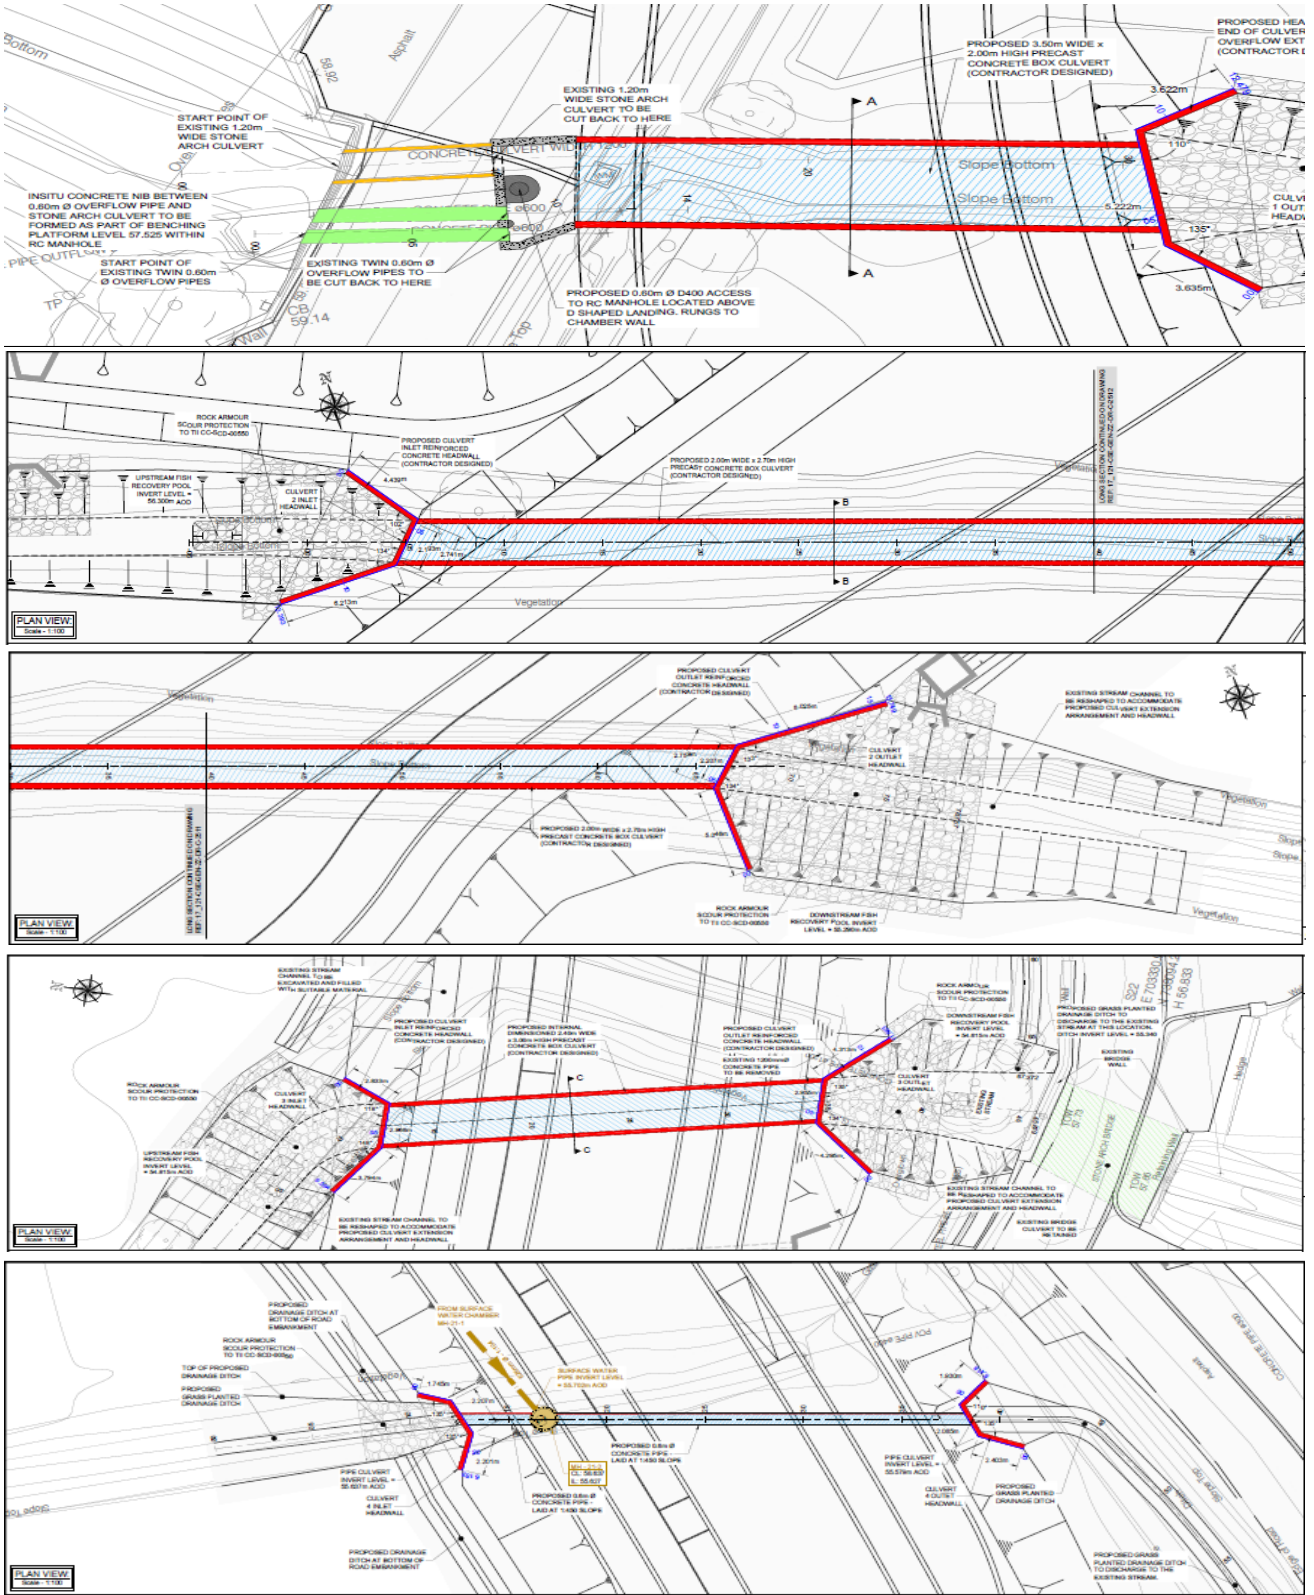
Construction Drawings - Clifton Scannell Emerson Associates, 2020). 1) Culvert 2 – Barnhill Road; 2) Culvert 3 – Upstream invert; 3) Culvert 3 – Downstream invert; 4) Culvert 4 – Stream redirected; 5) New drain culvert.
